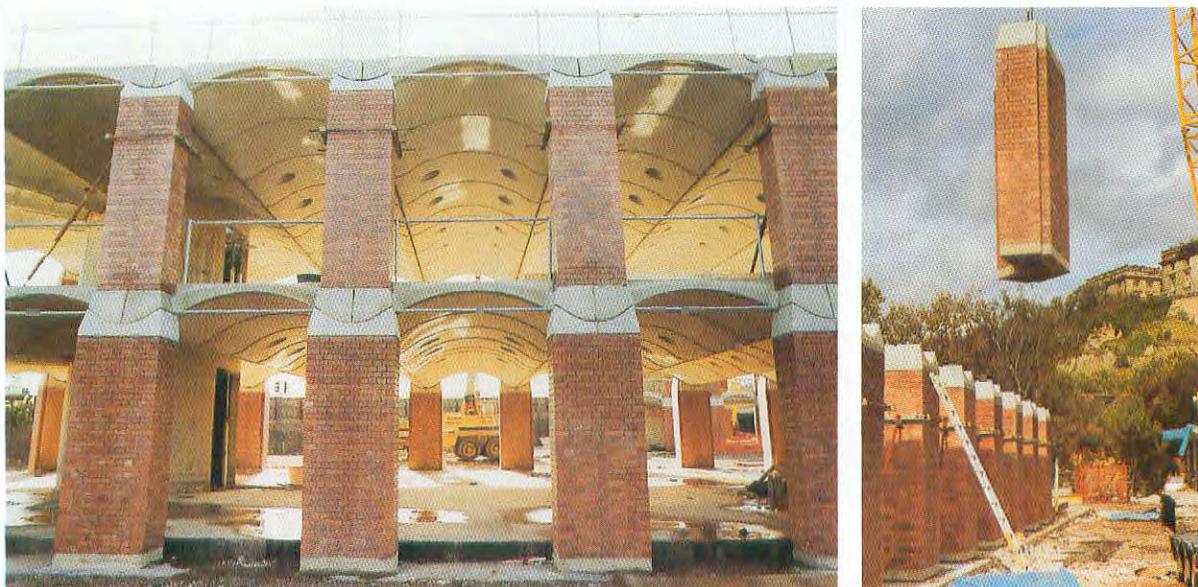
Inland Revenue Building in Nottingham, UK. (Courtesy of Trent Concrete Ltd., UK)
